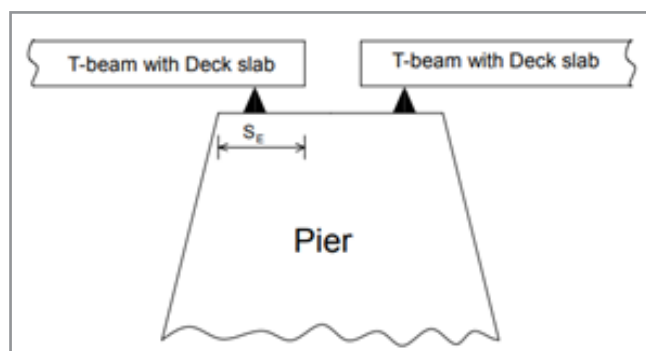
Arrangement of bearings on pier and minimum bearing seat width (SE)
